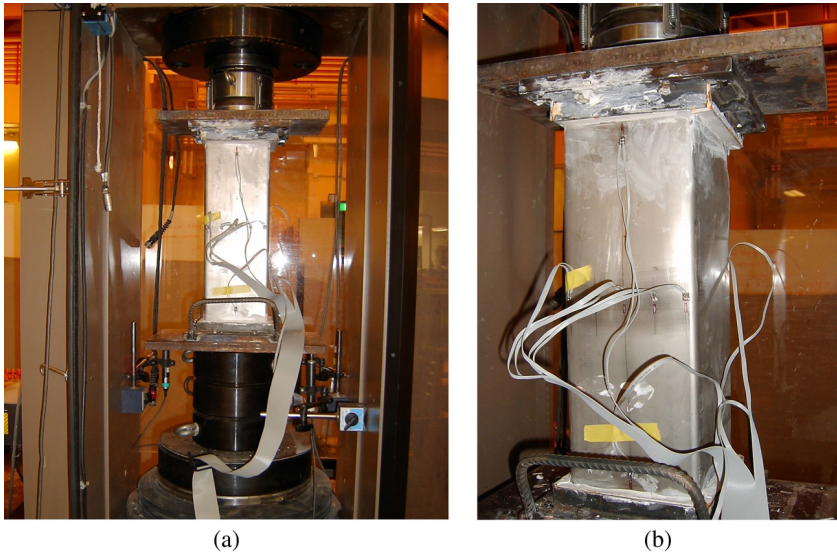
Test set-up of concrete-filled stainless steel tube specimens.
